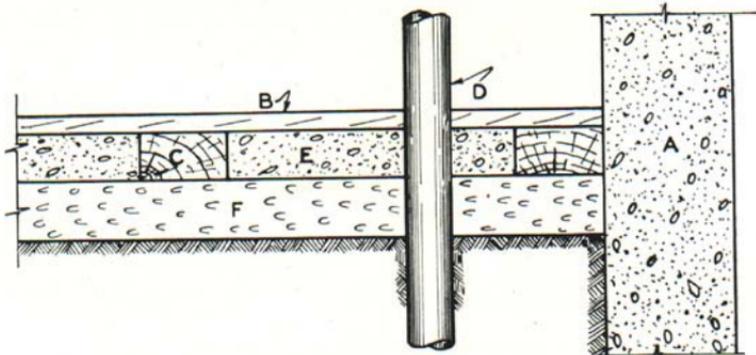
Dangerous type of construction. Pipe unprotected; union between floor and foundation wall not sealed; sleepers exposed to possible termite infestation from the ground through the coarse gravel. a, foundation wall; b, floor; c, untreated sleeper; d, pipe; e, dense concrete; f, coarse gravel or cinders.
